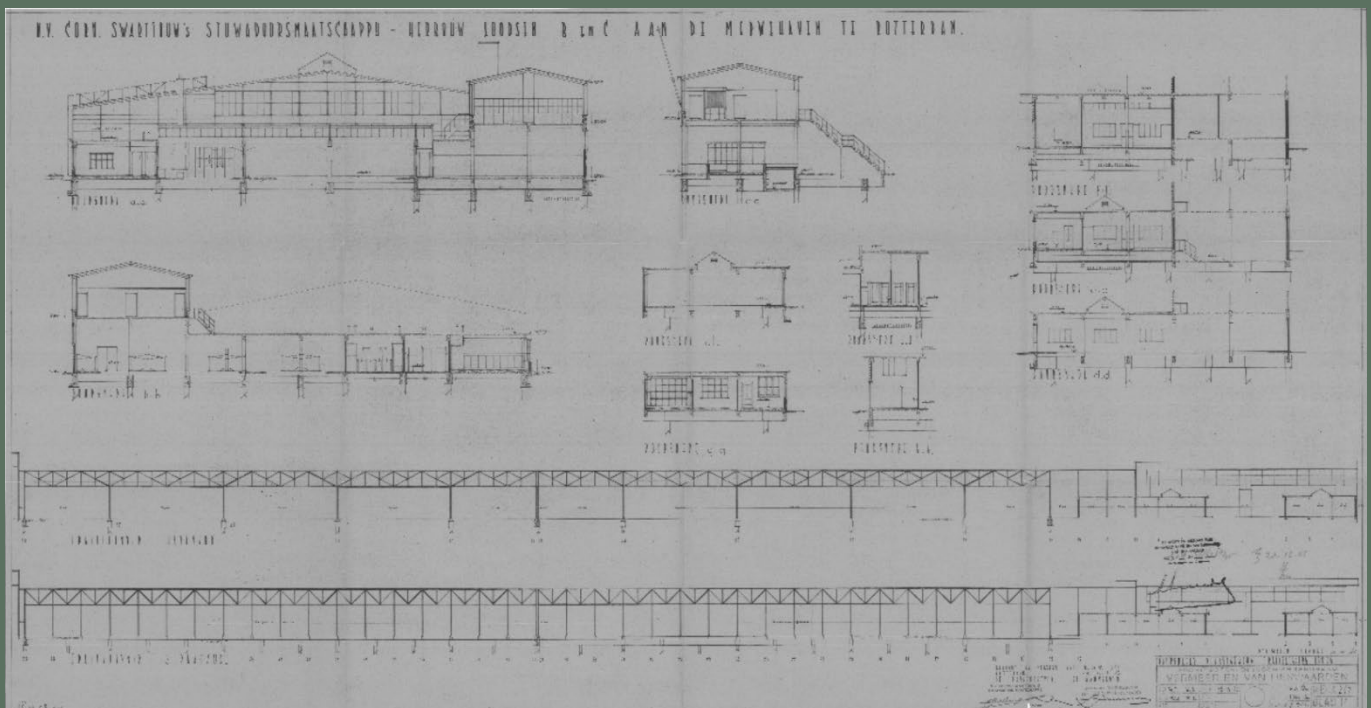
Section drawings Vermeer and Van Herwaarden architects of warehouses and office building
